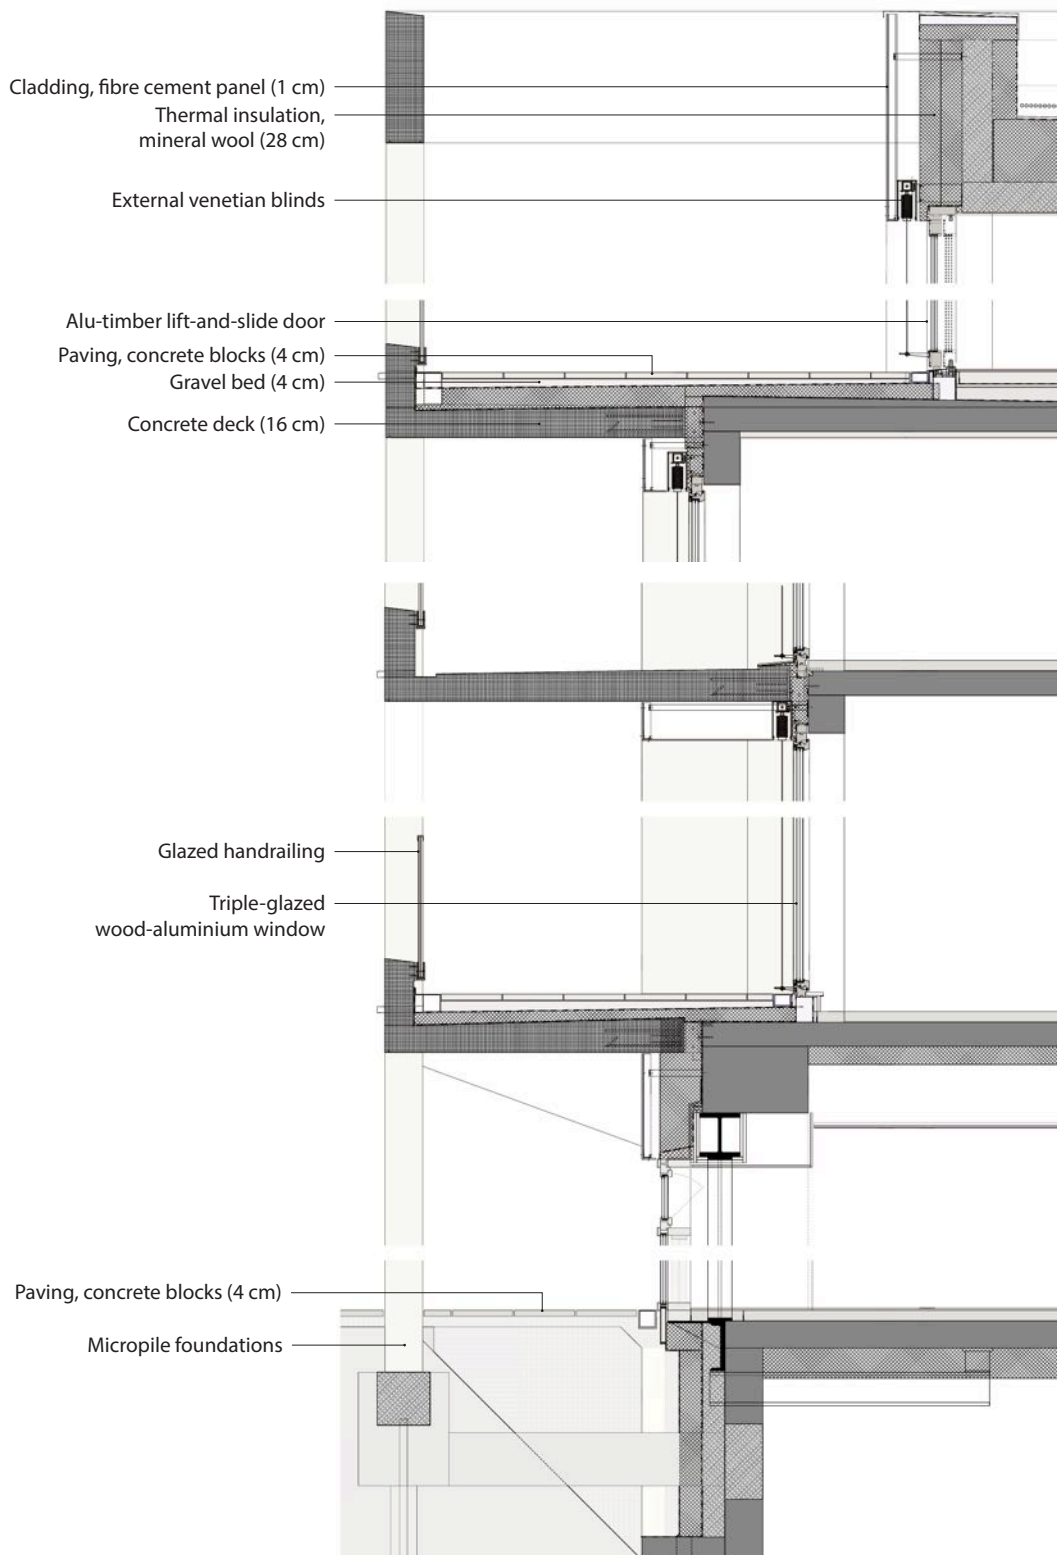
Wohnhochhaus Güterstraße 30. Construction section through south elevation (1:50)
